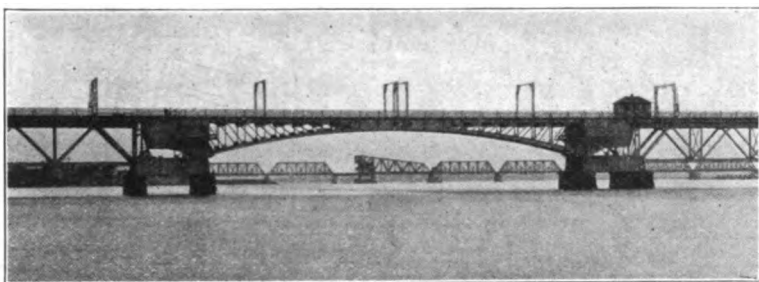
Rolling Lift Bridge Over the Connecticut River at Saybrook, Conn.
